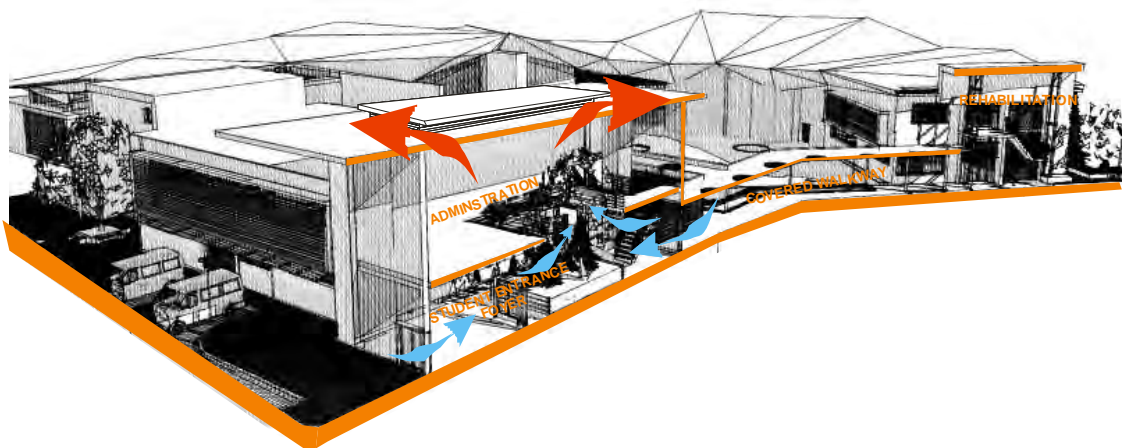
Showing the initial sketches of the dramatic roofing system (Source: Author).
